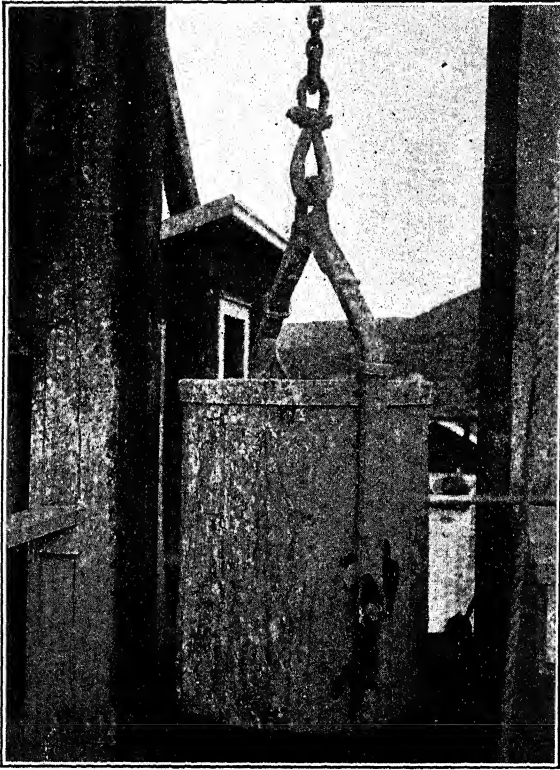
PLATE XIV.—BUCKET AND HOOK ARRANGEMENT FOR SUPPORTING BUCKET.
